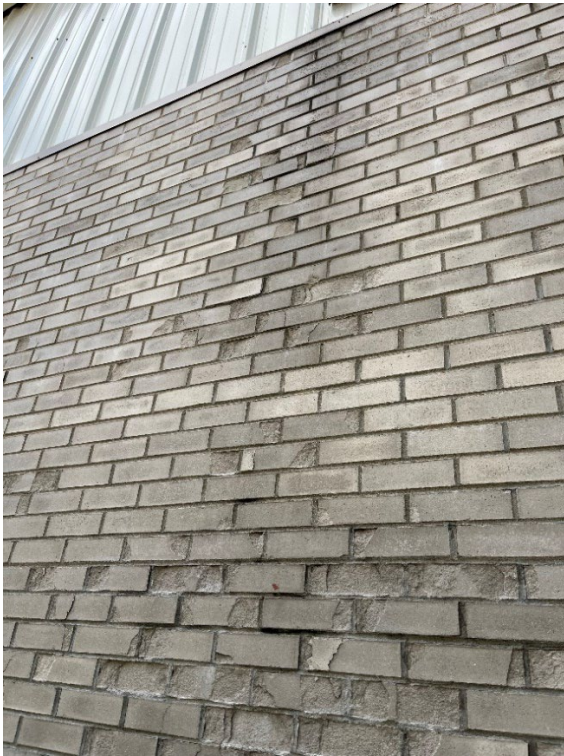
Spalling on north wall of gymnasium addition
